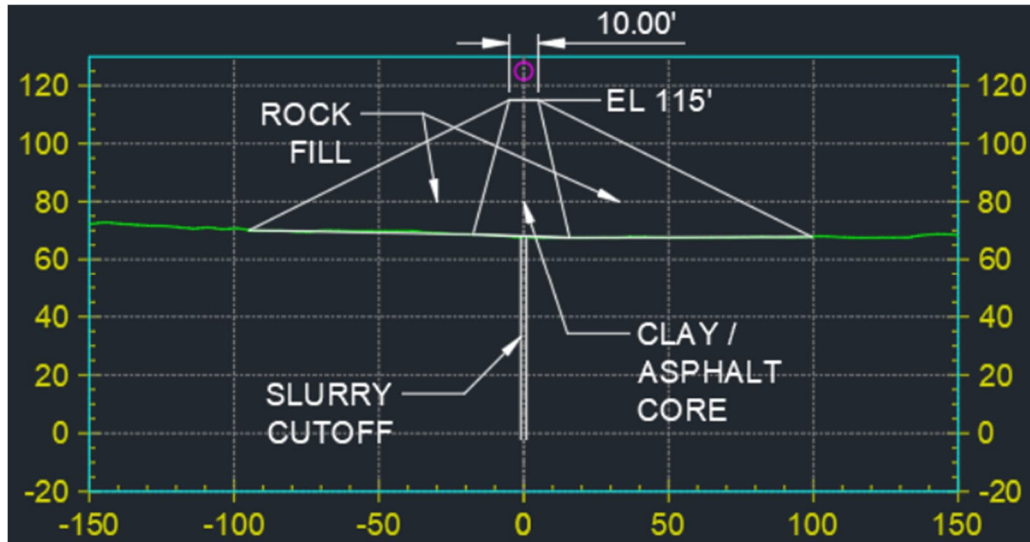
Typical Section for the Dam with a Maximum Elevation of 115 Feet
